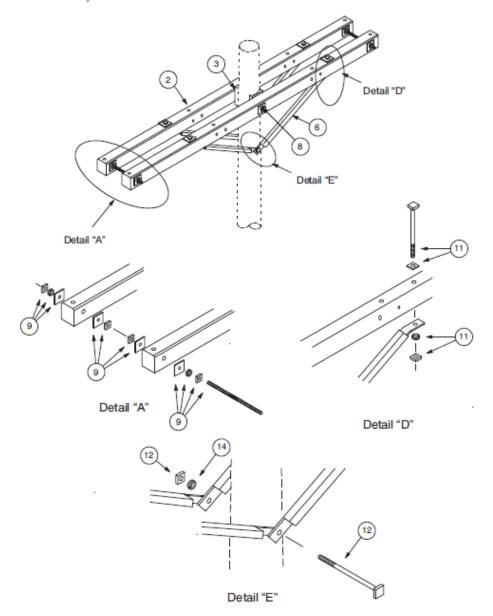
Double 8 ft. Wood Crossarm Assembly, Underarm Braces
